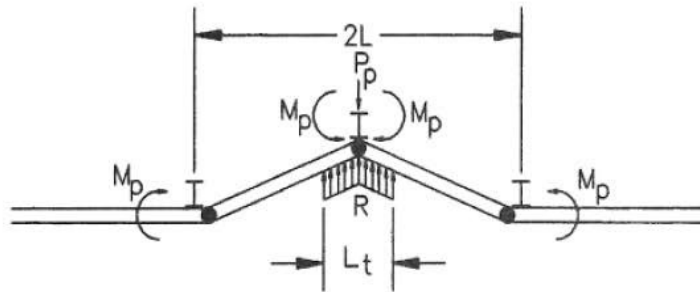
Two-Span Failure Mode for Post-and-Beam Railings
